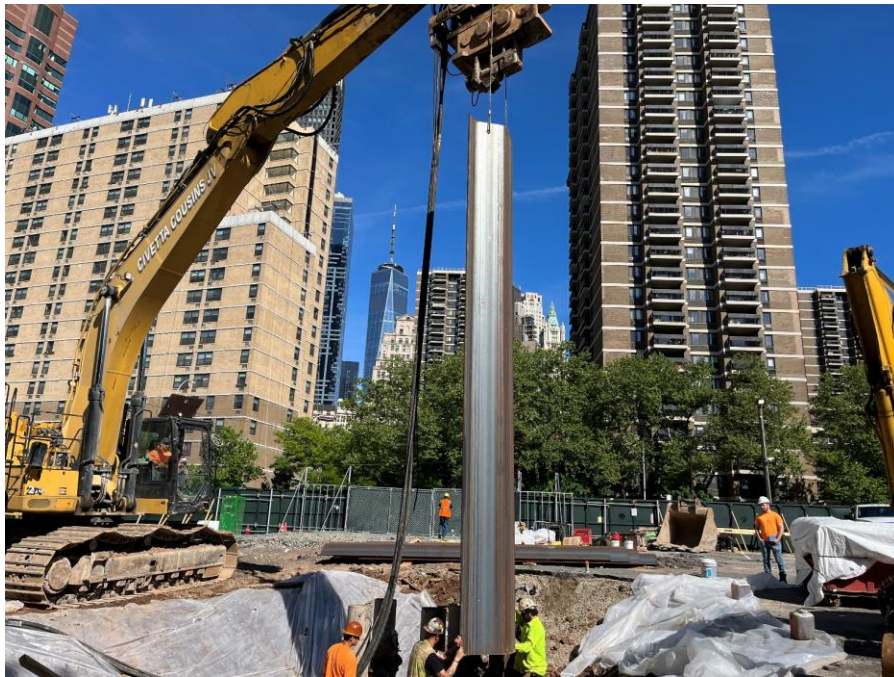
View of CCJV installing a steel sheet pile around the previously installed foundation piles (facing north)
